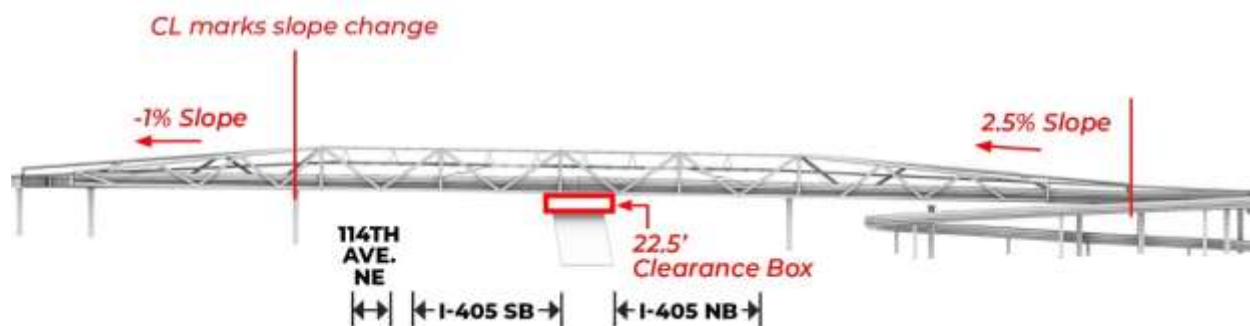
Elevation of the truss alternative over the I-405 span (looking north).
